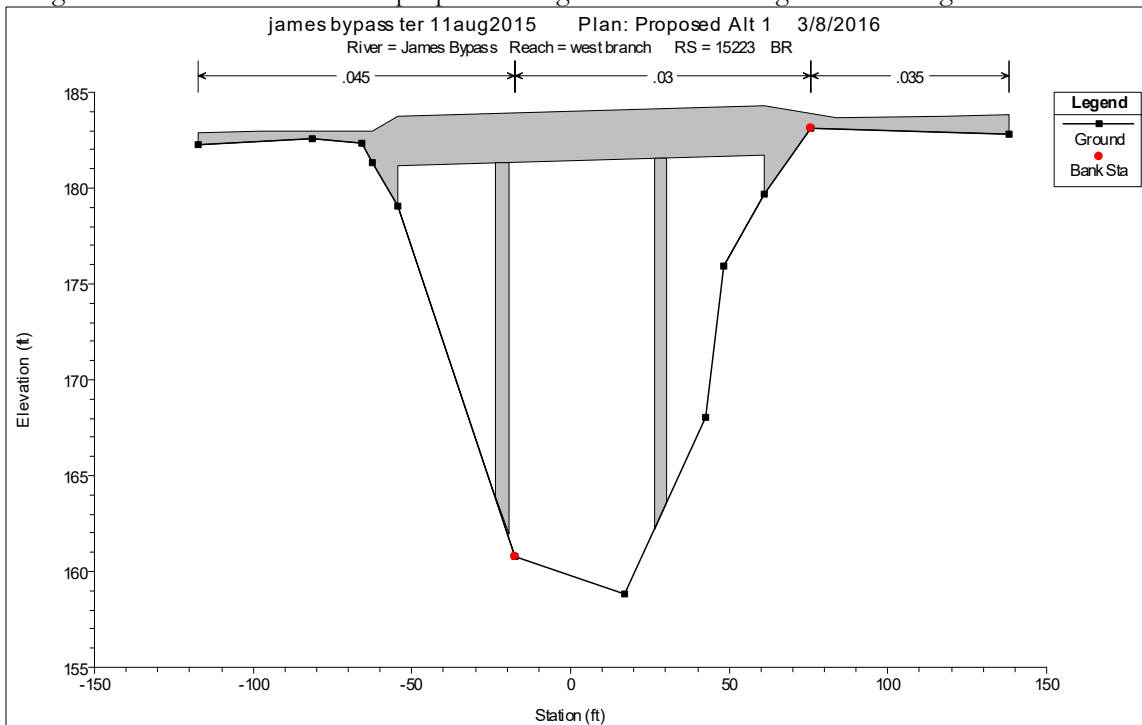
Profile of proposed bridge – West Branch (42C0066)
